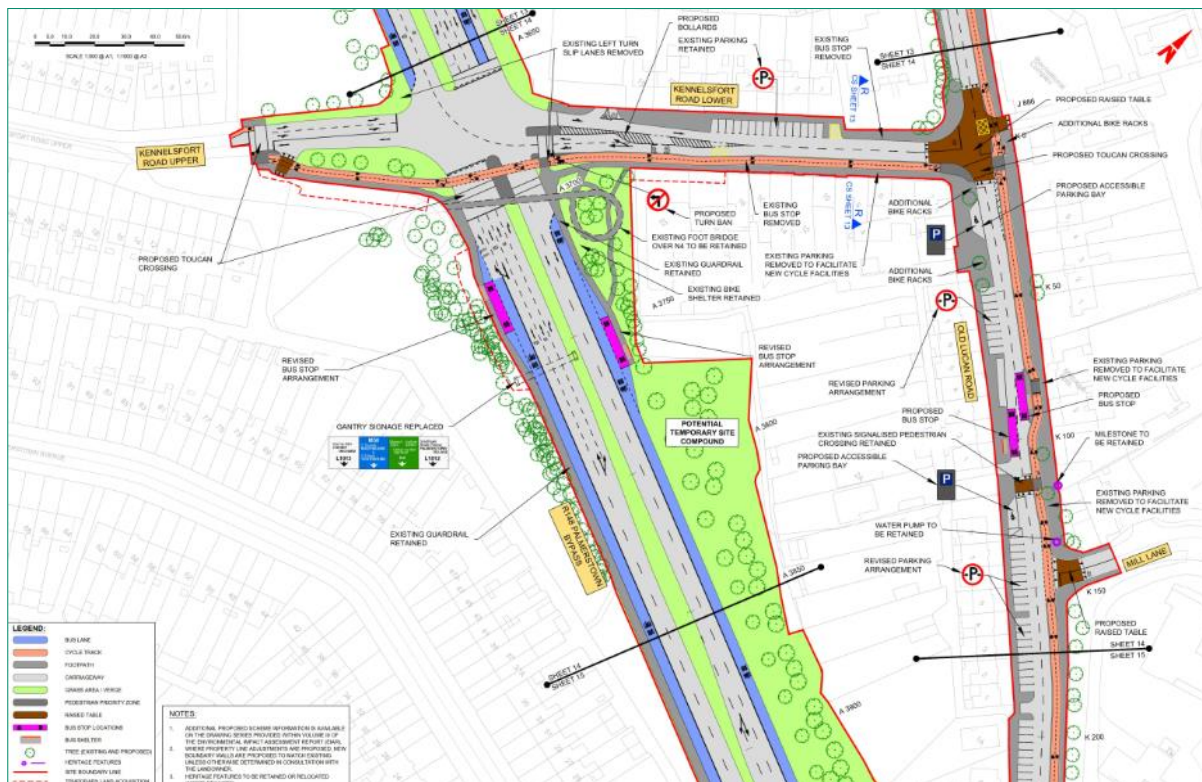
Extract 4 from General Arrangement Drawing (Sheet 14)
